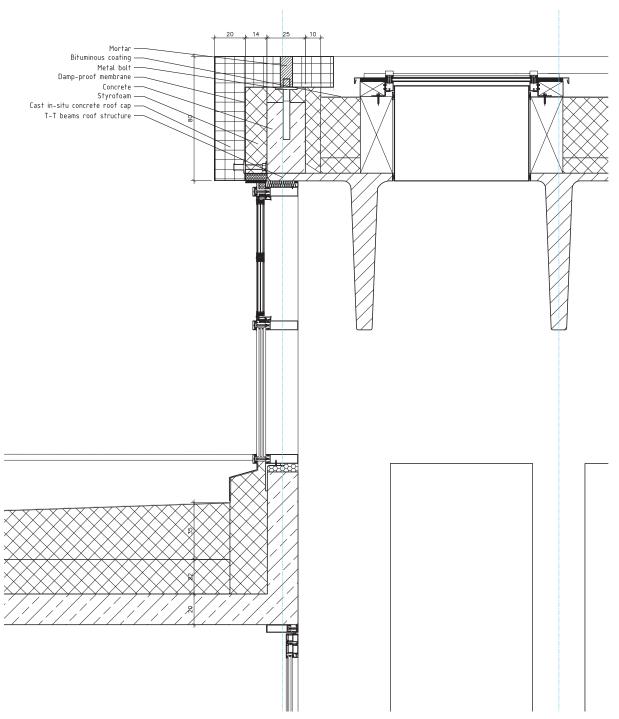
DETAIL OF ROOF CAP IN ATRIUM ROOF.
